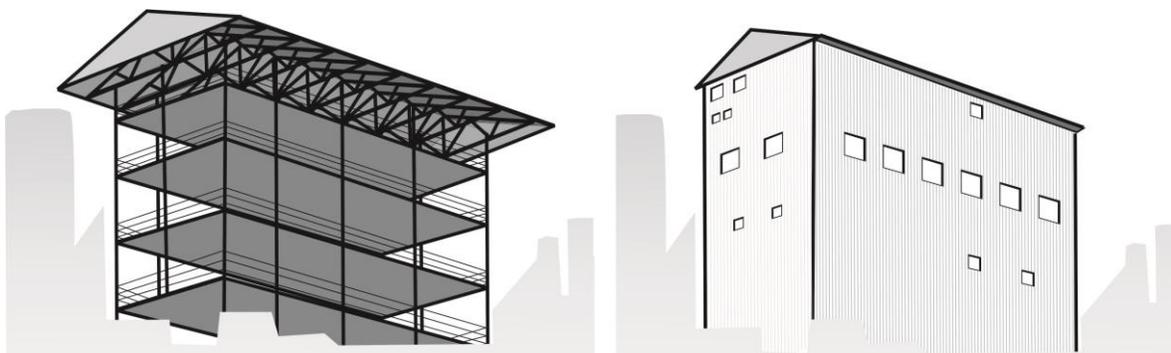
Illustration of an open structure design compared to a standard walled structure.
